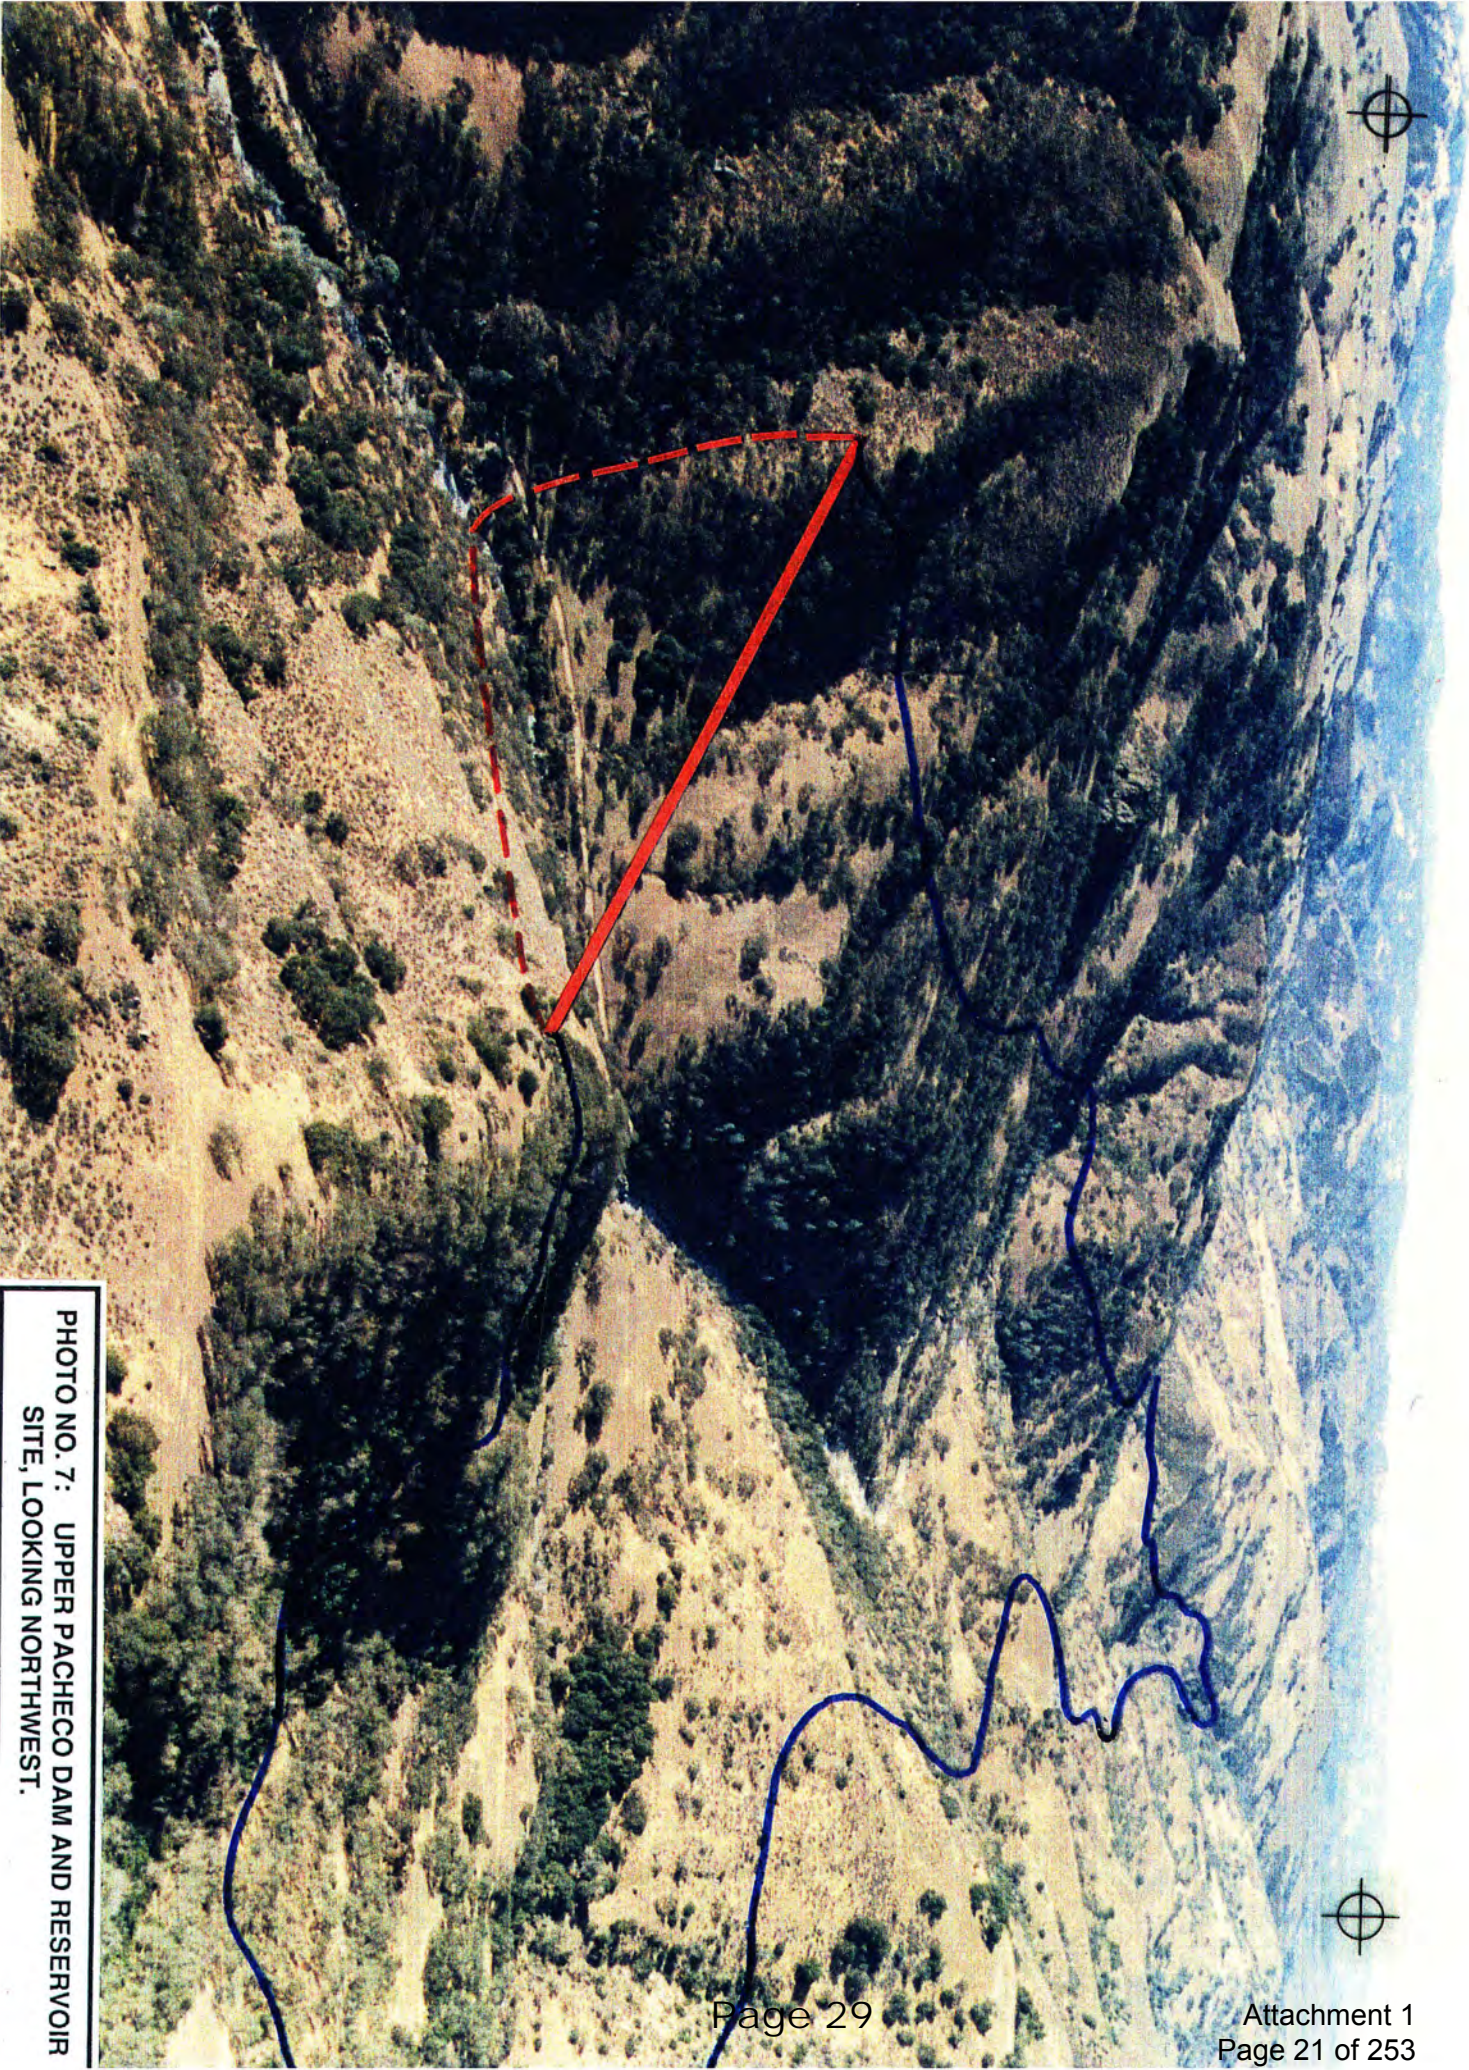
UPPER PACHECO DAM AND RESERVOIR SITE, LOOKING NORTHWEST.
